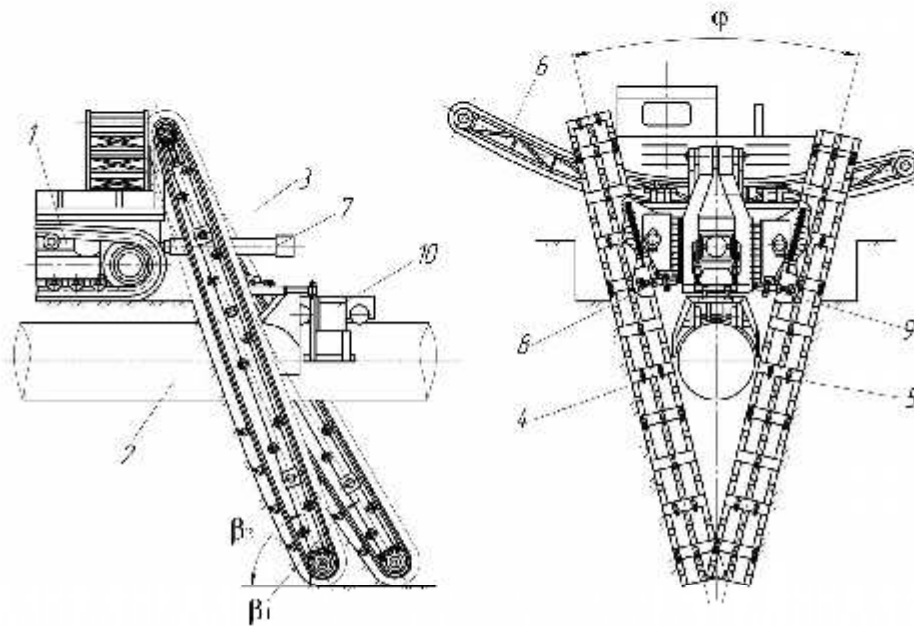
Chain trencher: 1 – basic machine; 2 – pipeline; 3 – working equipment; 4, 5 – chain section; 6 – conveyor; 7...9 – hydraulic cylinders; 10 – control devices
